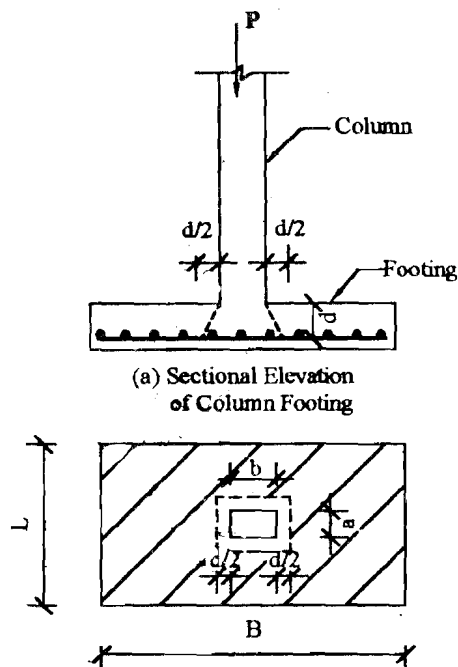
Critical Section for Two-way S. F. for Column Footing
